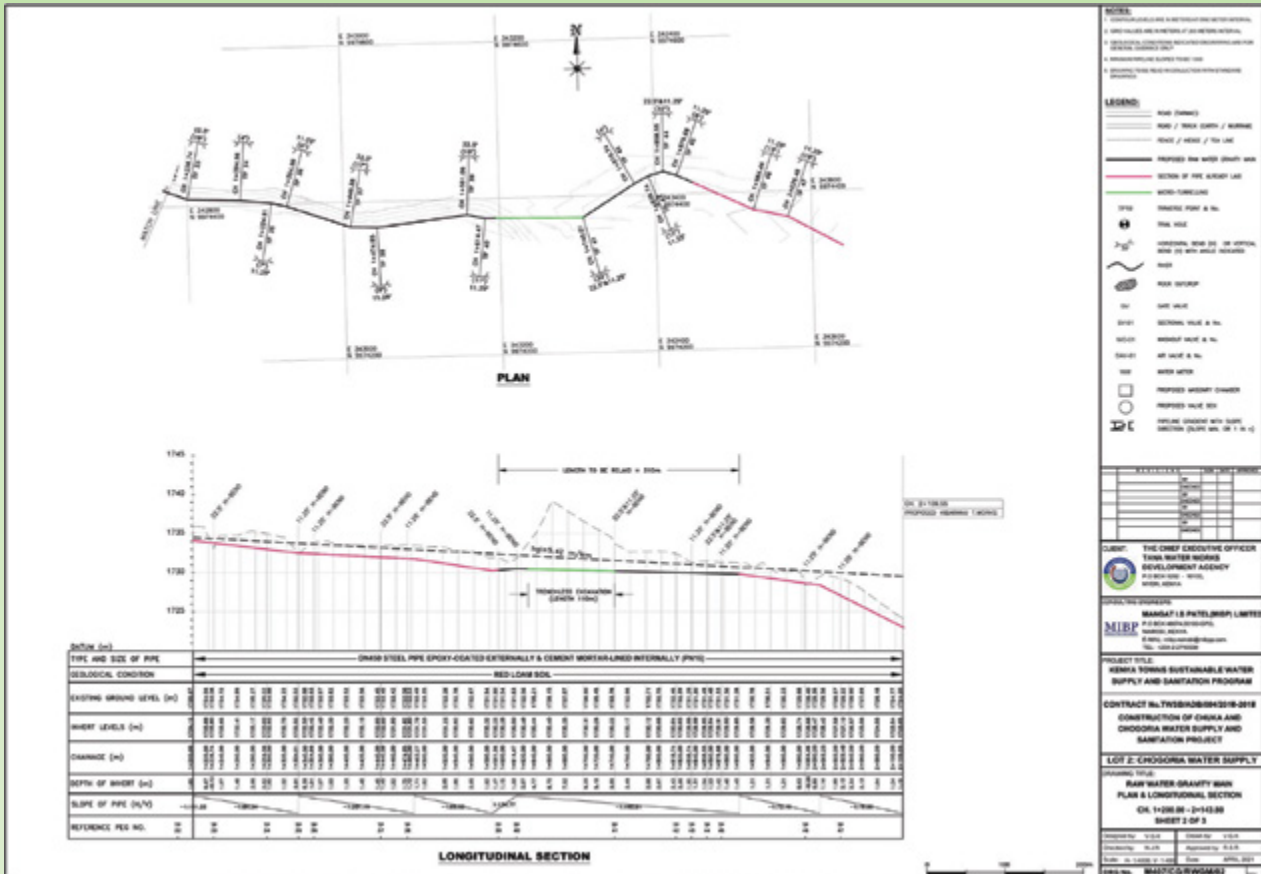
Plan and Profile of Raw Water Gravity Main at Tunnelling Section
